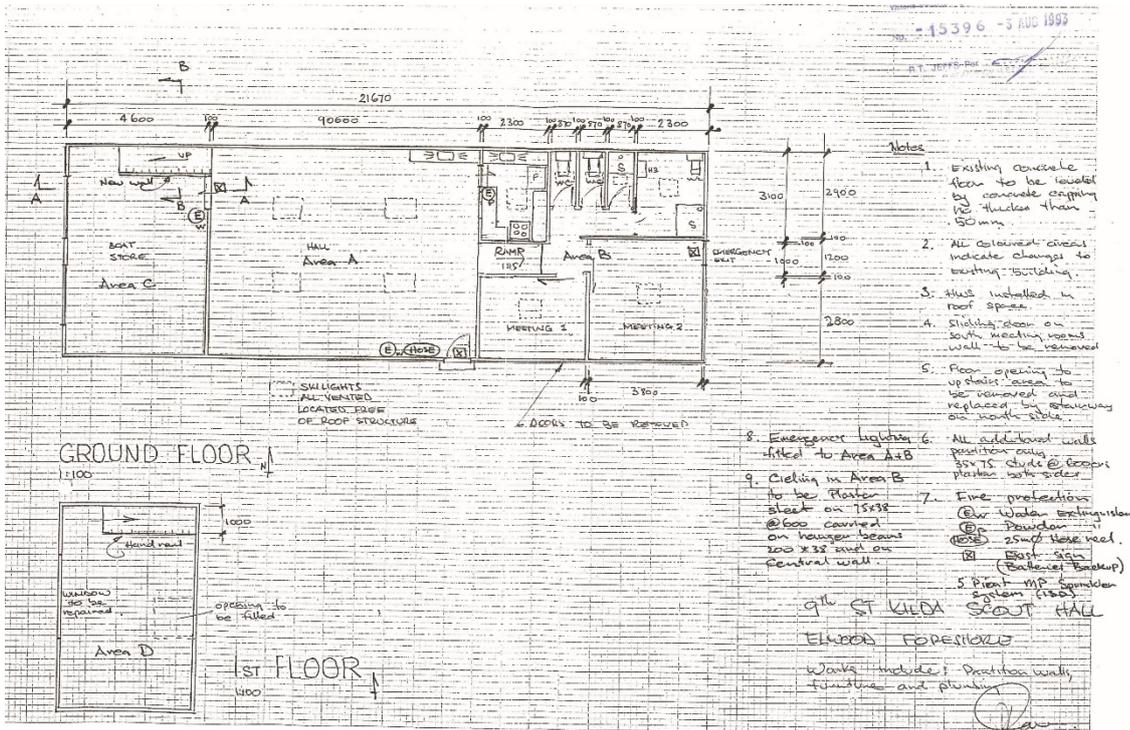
Plan drawing of the proposed development plans for the Elwood Sea Scout Hall approved in 1993 noting the proposed changes to each area with stairways in Area C and Area D to be relocated. (Source: City of St Kilda)
